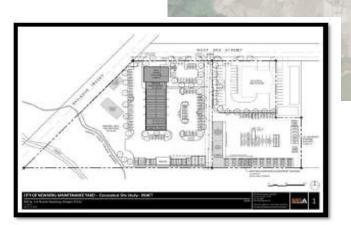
CONCEPTUAL PUBIC WORKS MAINTENANCE YARD PLAN
